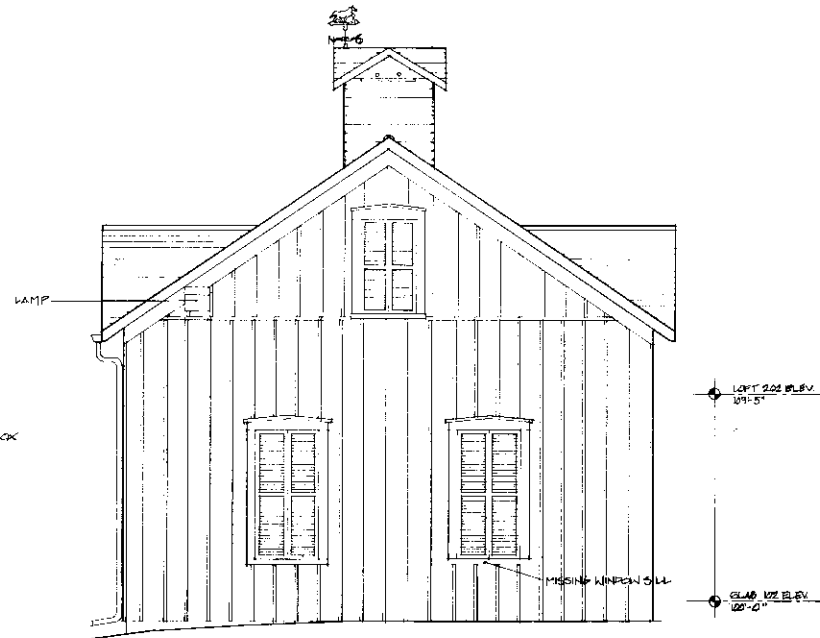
Truman Carriage House, Fall 1985. West elevation (looking east).
